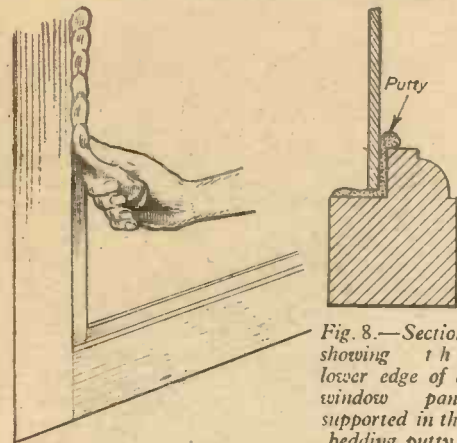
Section showing the lower edge of a window pane supported in the bedding putty.
